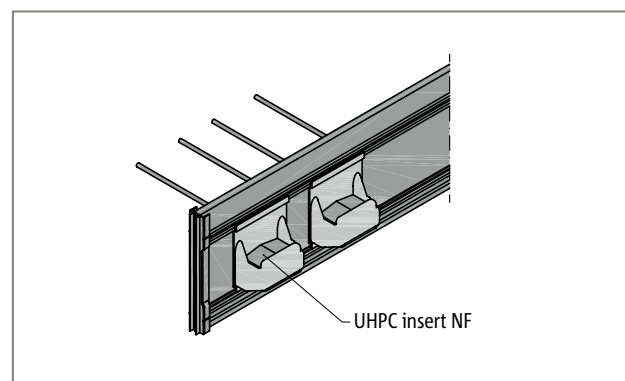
Schöck Tronsole® type T: Detail support bracket negative fabrication
